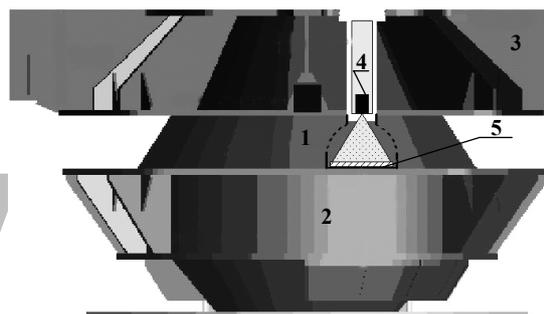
Measurement system location on oil-drilling platform: 1 - slider bearing, 2 - support, 3 - platform, 4 - image unit, 5 - target.
